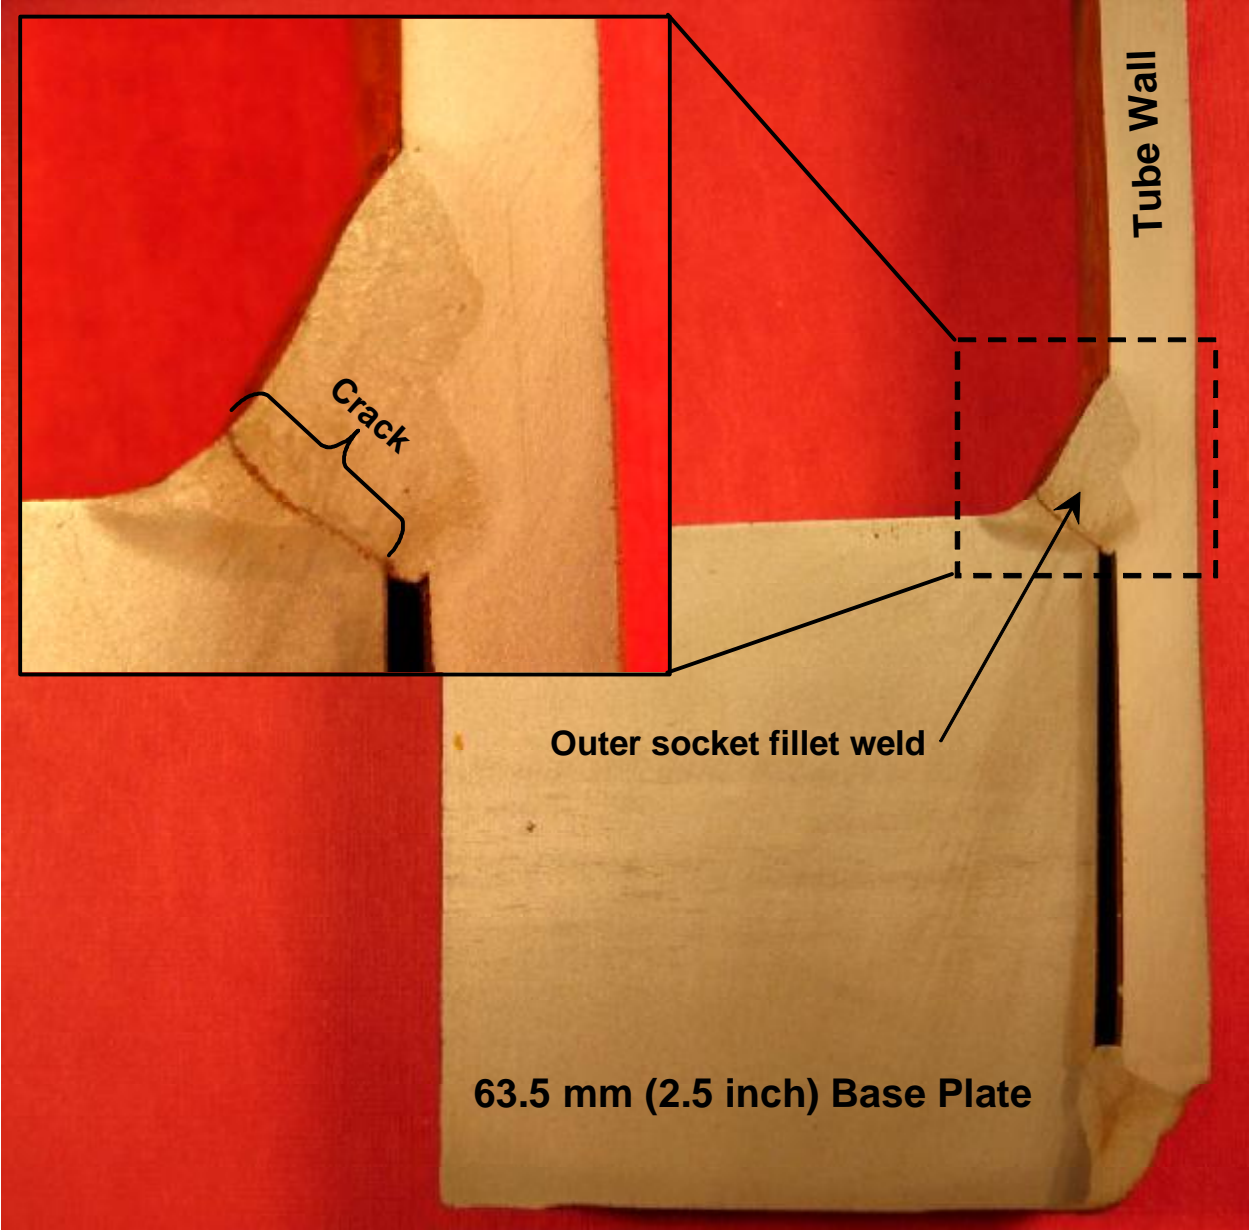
Macro etched cross-section of weld root crack.
